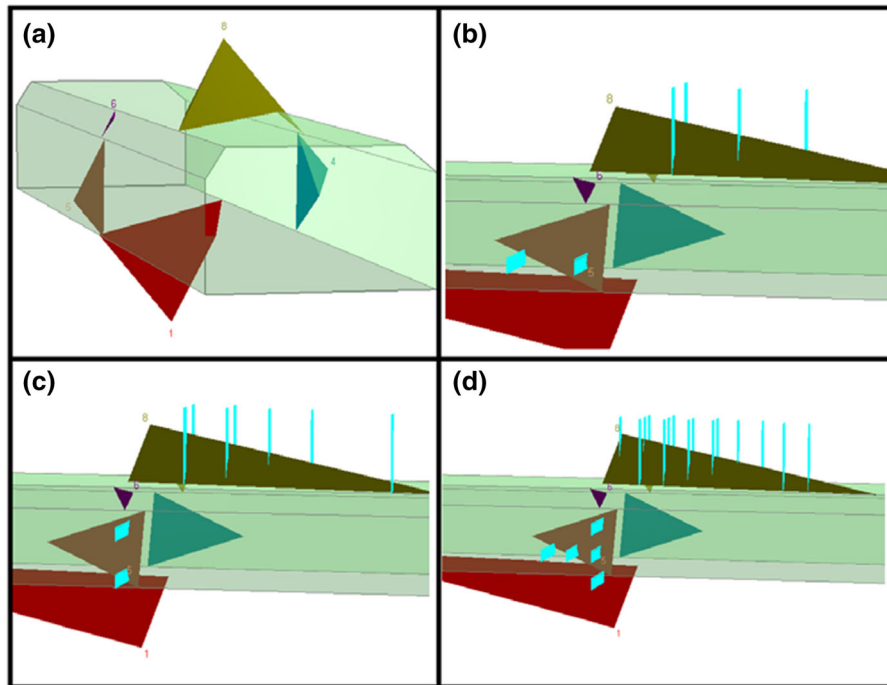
3D distribution of support units across the excavation on the Northern side of mining a 3D view of excavation without support unit installed, b 3D view of an excavation with support units installed on  $2.0 \text{ m} \times 2.0 \text{ m}$  in the opening plane of the excavation c 3D view of an excavation with support units
